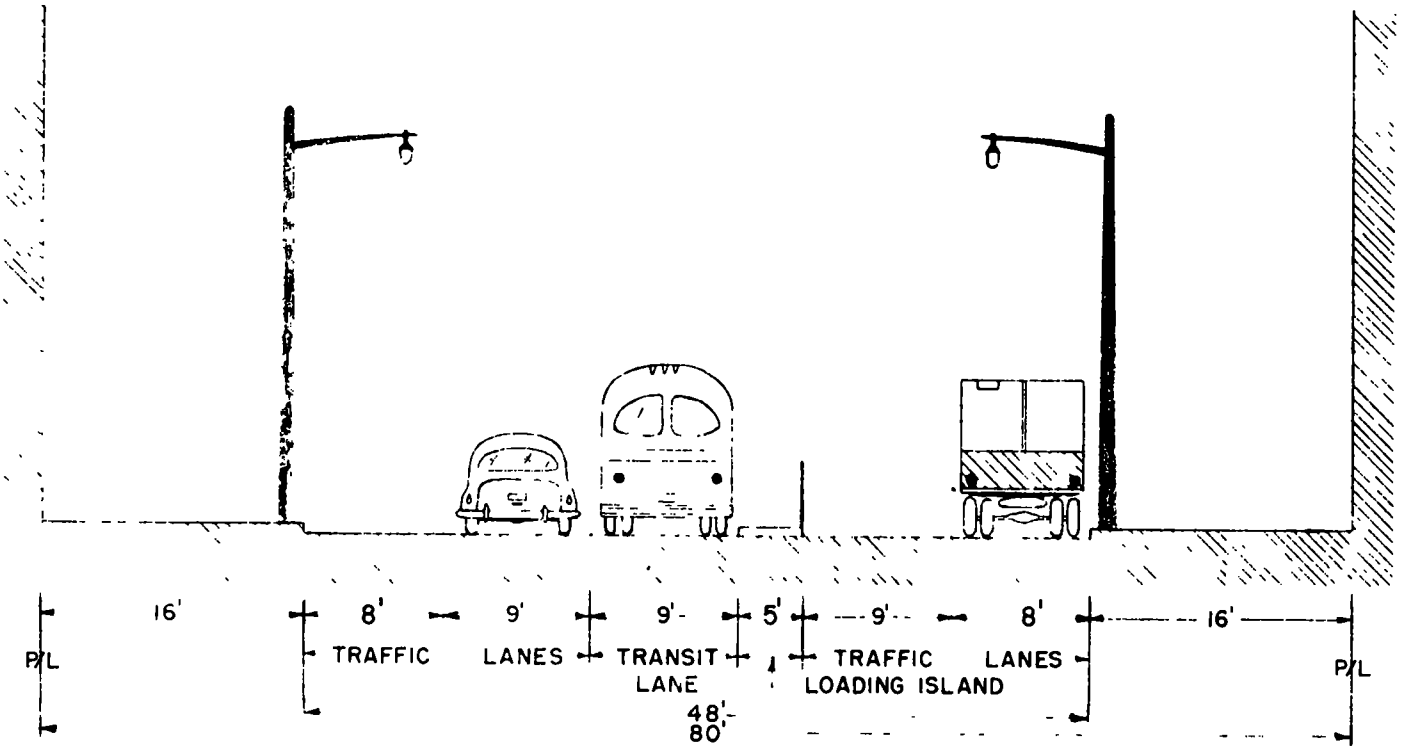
Typical cross section, Washington Street bus lane, Chicago, Ill
